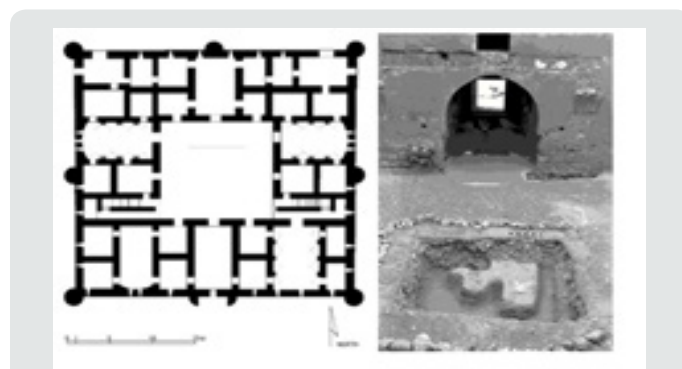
floor plan of Kharanah on the left, the right picture is a view of the courtyard from the north with the cistern and drain in the entry passage.
